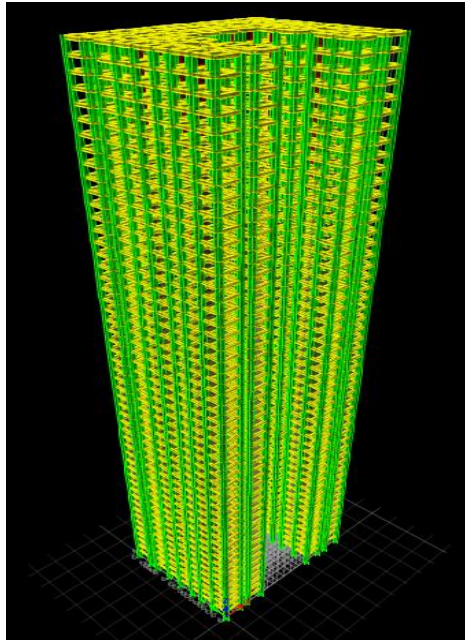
ELEVATION (MODEL NO 1 - BARE FRAME STRUCTURE)
